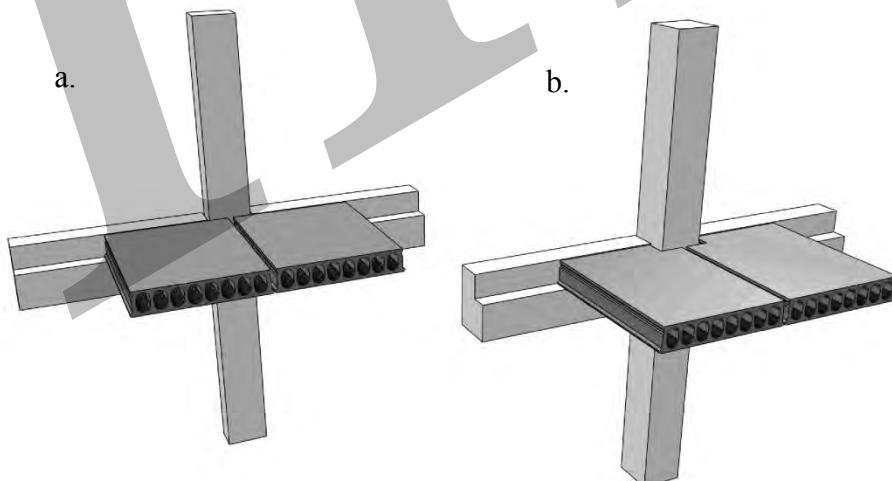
Variant solutions for L-shape edge beams - a. wider beam allows floor slab to be uninterrupted; b. floor slab is notched at the column
